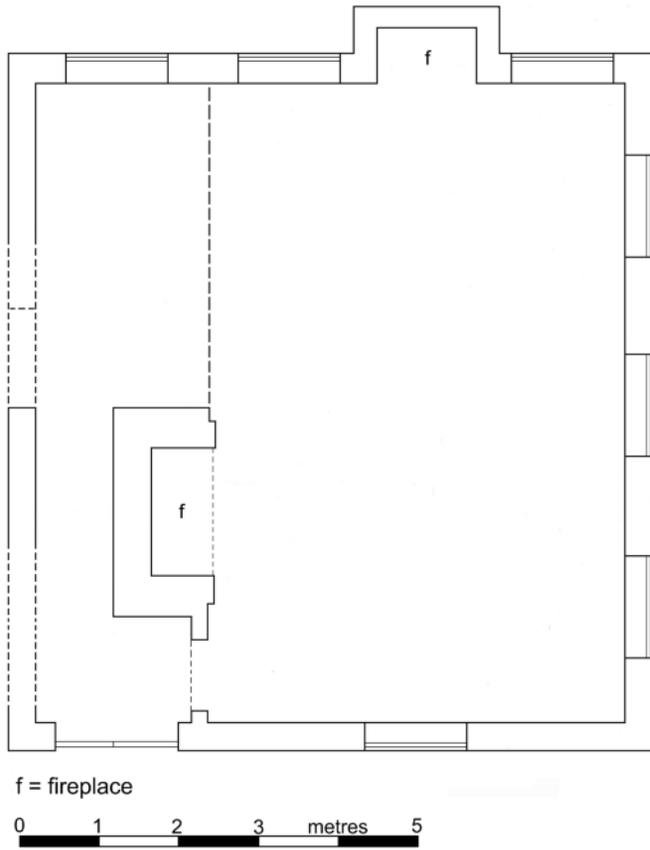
Ground-floor plan of the 17th-century section of Shell House, with later additions removed for clarity
